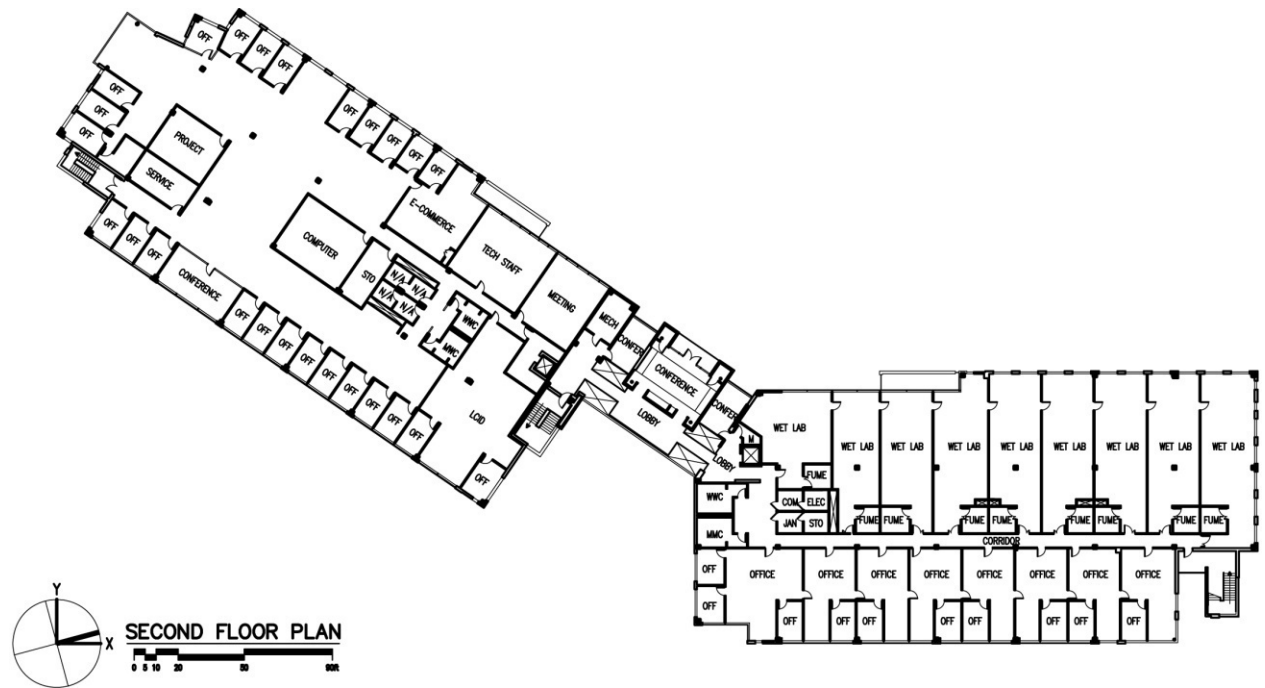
Second floor plan of the KnowledgeWorks I & II buildings redrawn from the original drawing of SMBW Architects, P.C.
